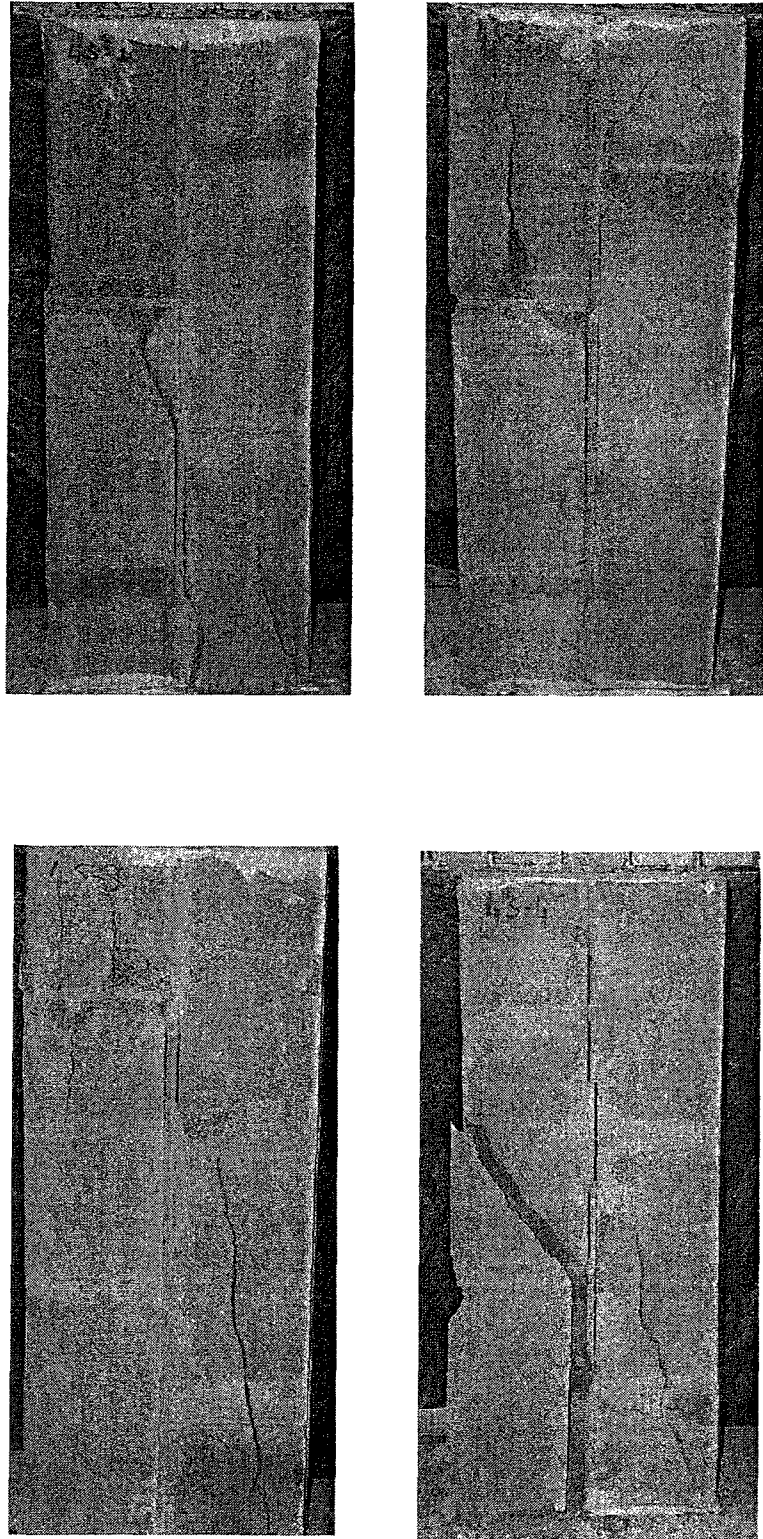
Failed compressive masonry prisms with 4" cores having 10M steel rebars at the head joints, loaded parallel to their bed joints.
